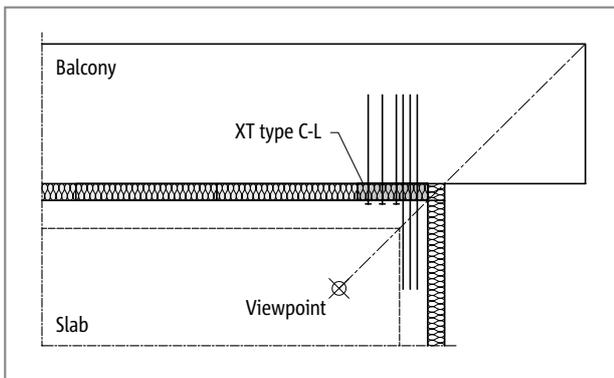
Schöck Isokorb® XT type C: Balcony projecting over corner of building (application XT type C-L)
